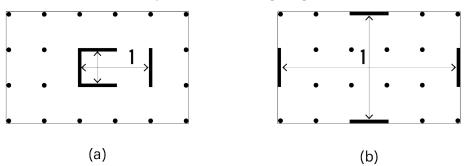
Two ground floor plans of buildings. In (a) earthquake forces in each direction, across and along the building, are resisted by two walls placed reasonably symmetrically. The walls are separated (1) but not by much. However, in (b) the walls acting in each direction have maximum separation (1) and so provide the best control of torsion.
